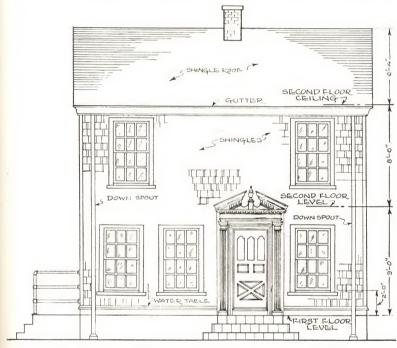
Remodeled Elevation for House Shown in Figs. 94 and 95
